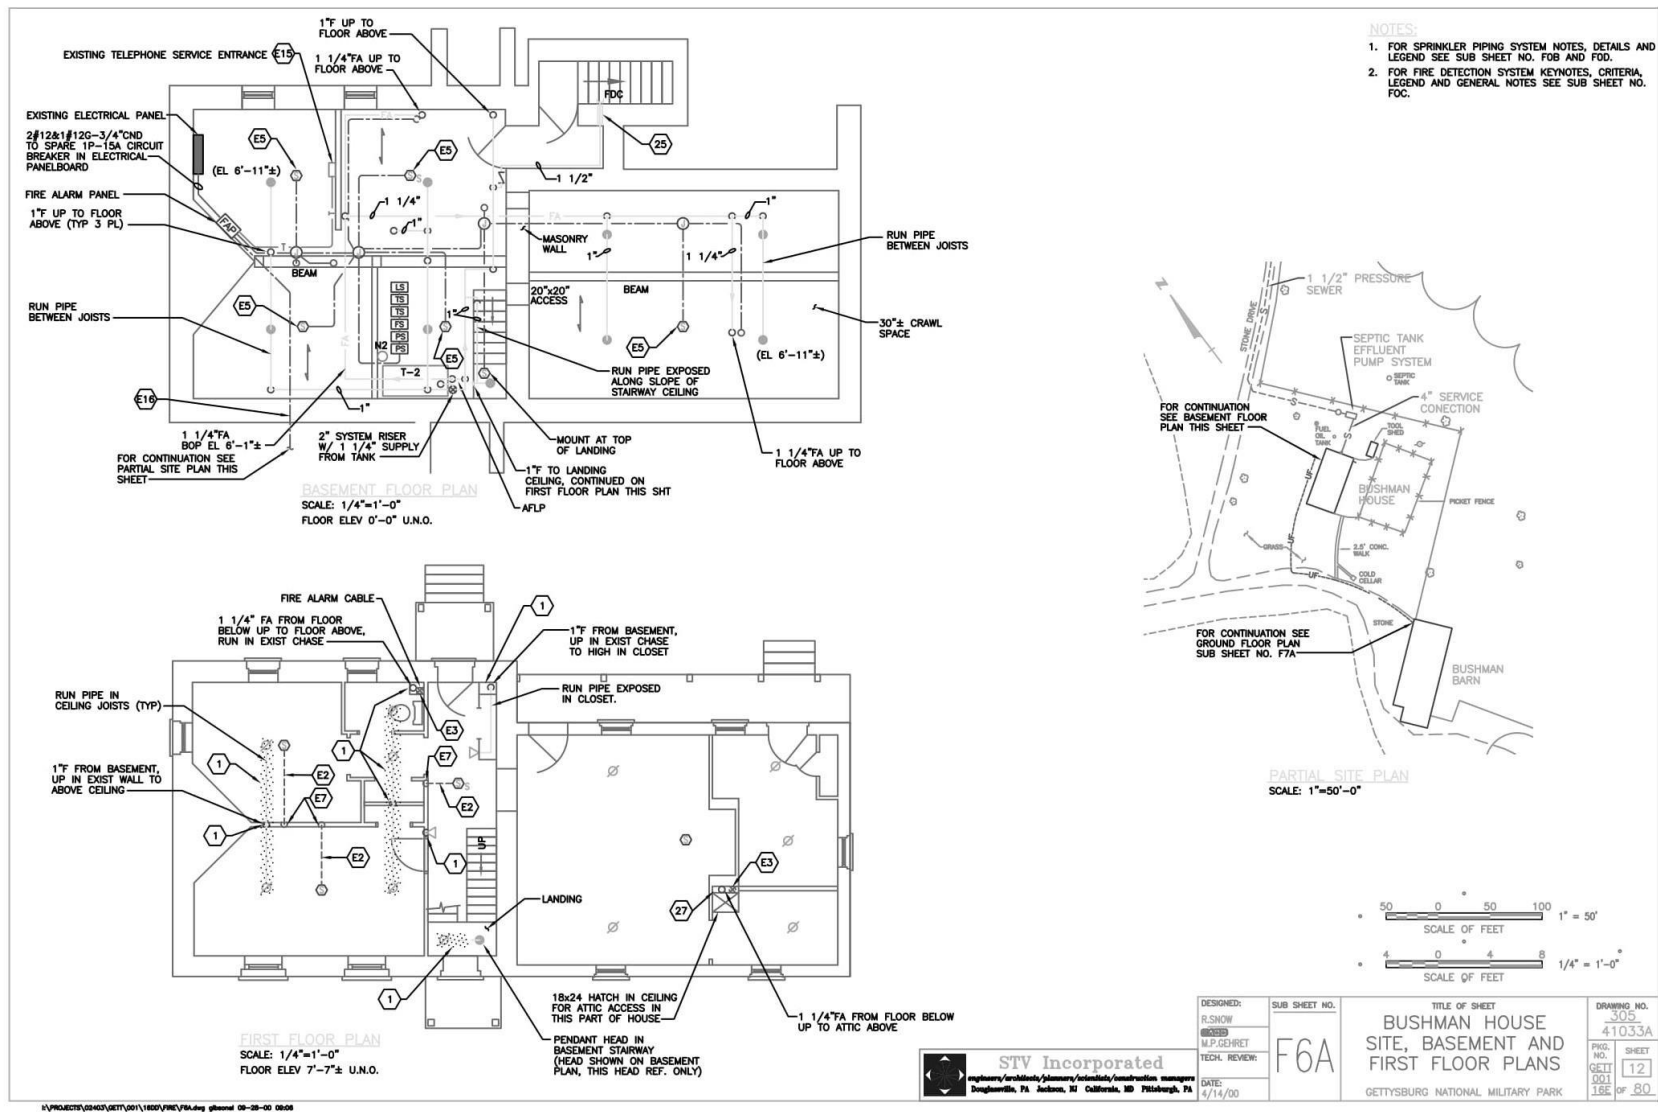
Bushman Farmhouse floorplans – basement and first floor.
